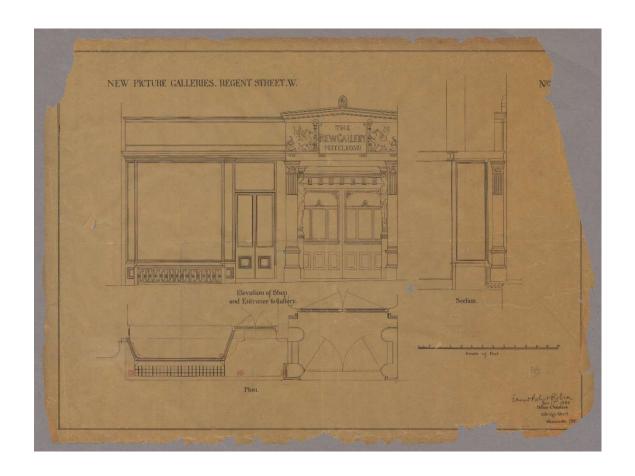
EDWARD R. ROBSON, DRAWING OF ENTRANCE PORTICO, NEW GALLERY, 1888.
